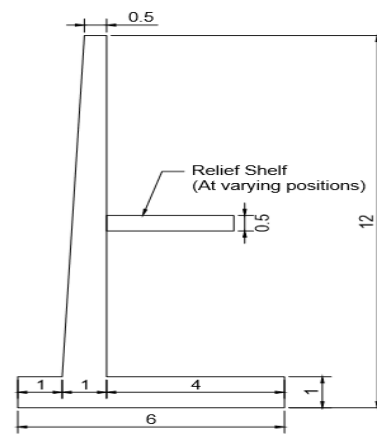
Typical cross-sectional detail for Cantilever retaining wall with shelf
